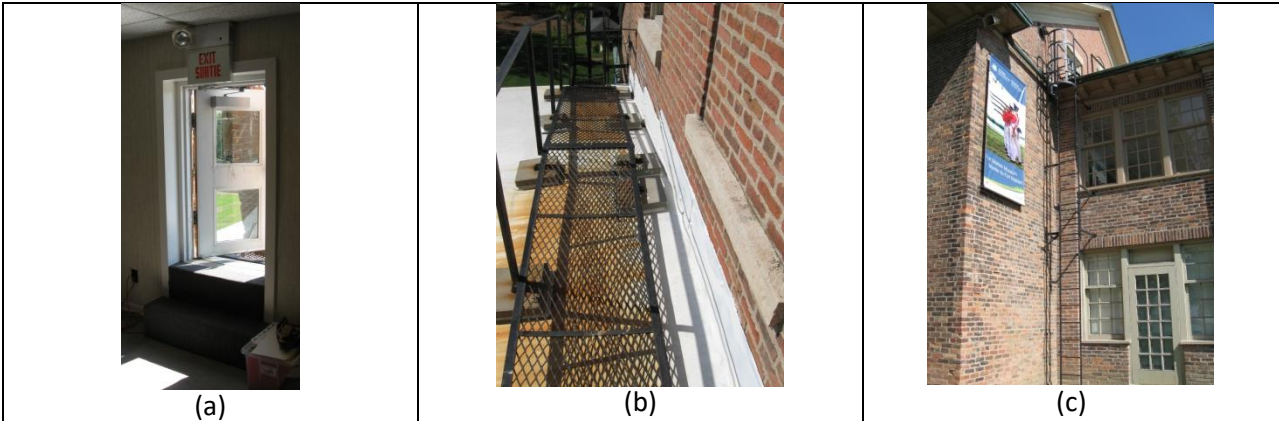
3rd Floor Fire Escape (a) from inside 3rd floor; (b) travel along roof; (c) ladder that extends to the ground
